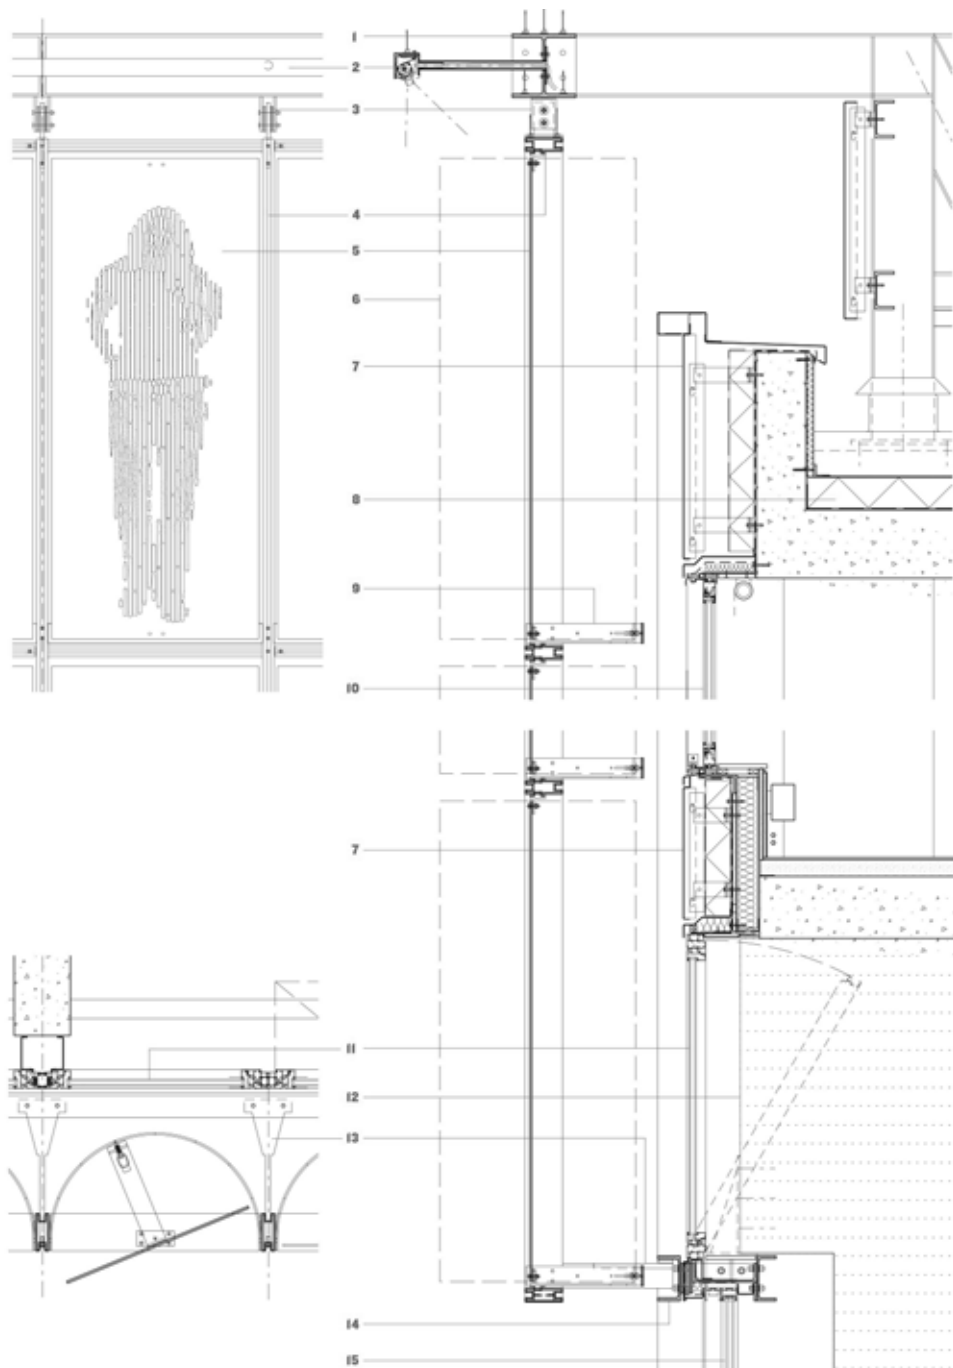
Solar shading detail elevation, section and plan (NTS):
